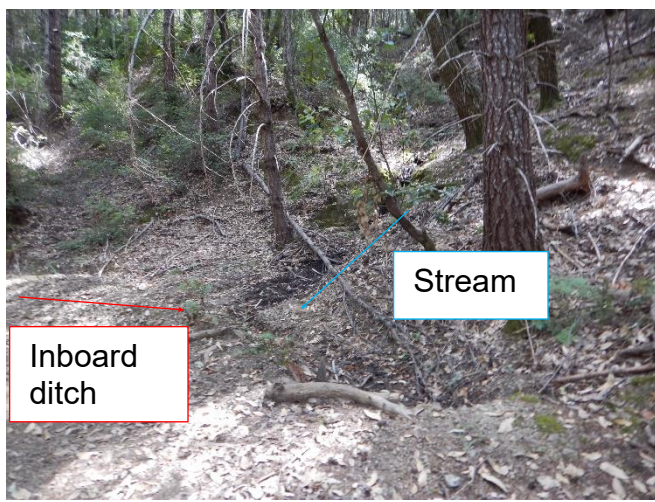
FR19; stream and inboard ditch converge near culvert stream crossing inlet
